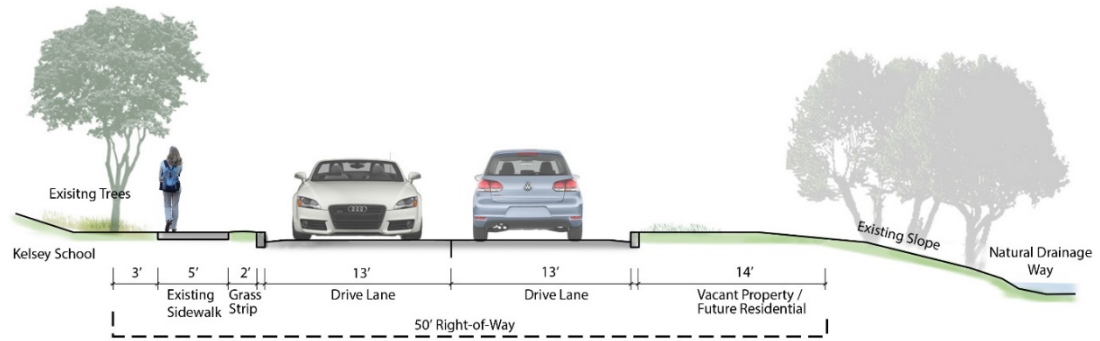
Section B-B – Existing Street Cross Section (By author)
